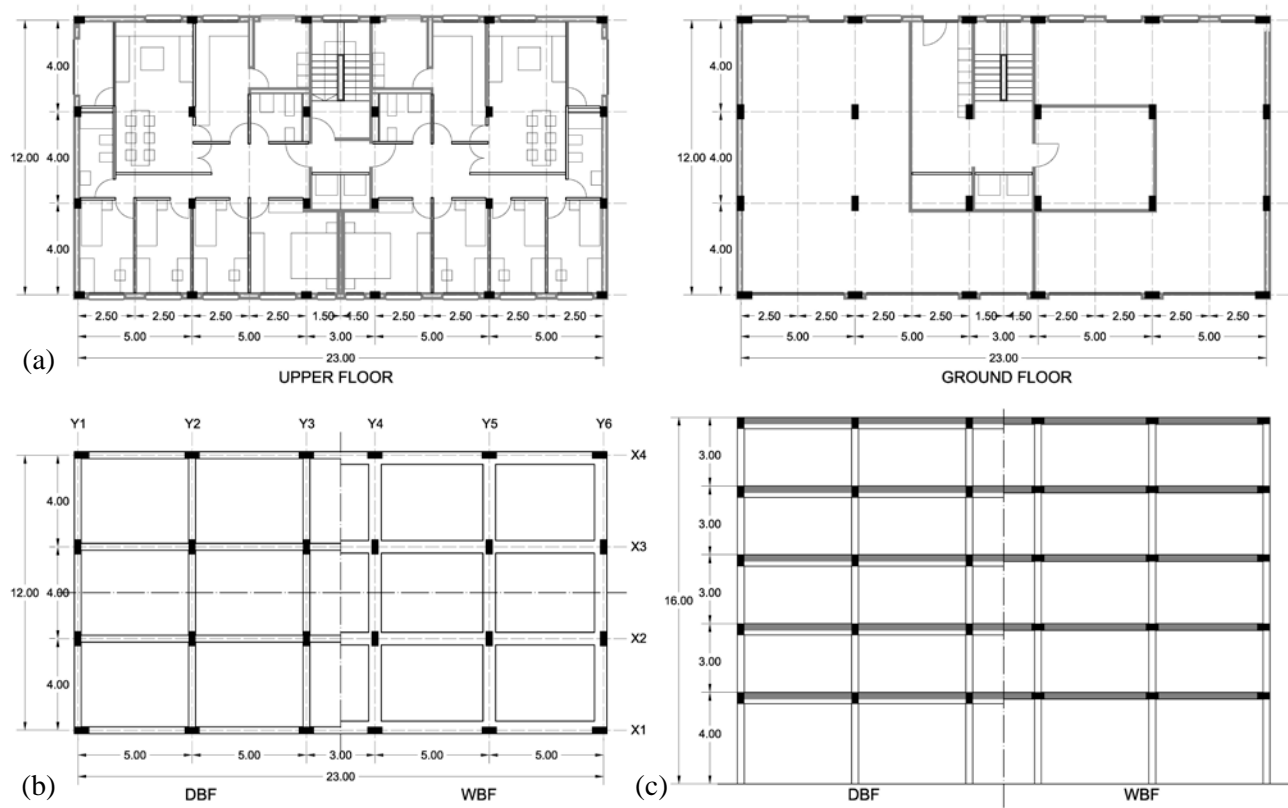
Case study: distribution (a) and structural arrangement in plan (b), and in elevation (c).
